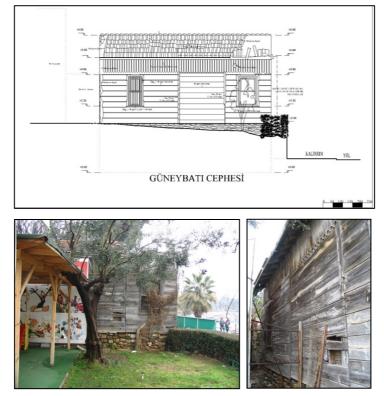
(1) Drawing of the Southwest Facade (2) Photos of the Southwest Facade (Tanrıverdi, 2011)
